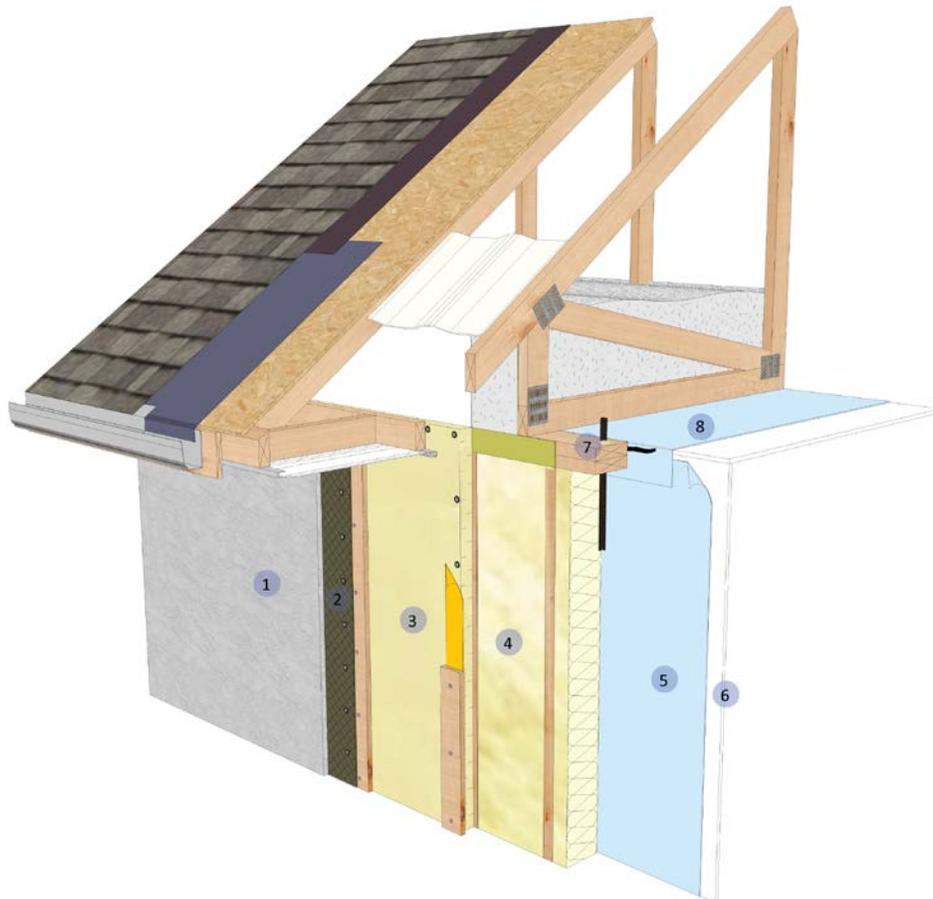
Simplified view of an above grade wall to roof transition as trialed by the Manitoba LEEP builder group with an exterior insulated and air sealed wall/roof system. Illustration: Natural Resources Canada
